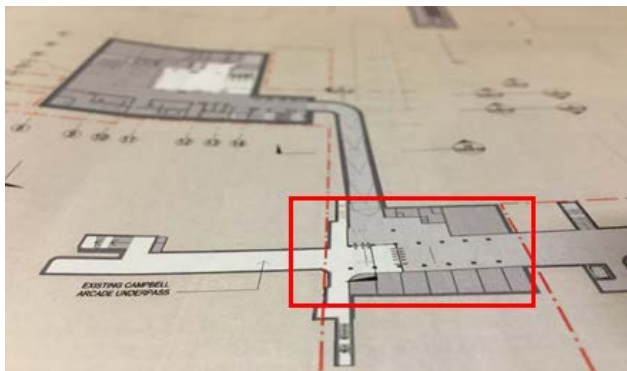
Area outlined in red highlights proposed impact on Campbell Arcade
